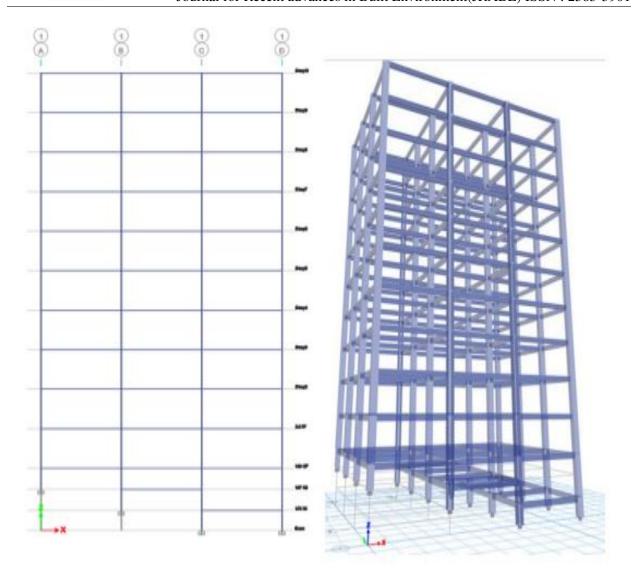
Front elevation and 3D view of 15⁰ model with fixed base
